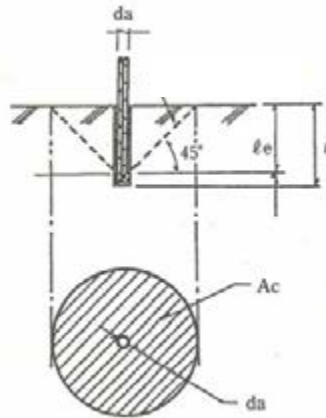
Projected area of concrete cone failure surface of a single anchor (45 degree cut bolt) A_c
